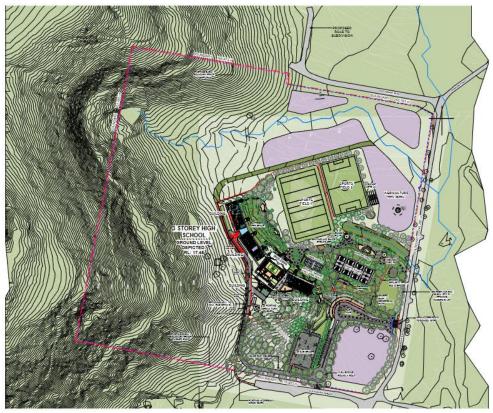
Overall site context plan. EJE Architecture RRHC-EJE-00-ZZ-M3-A-0010 (23/6/25)
